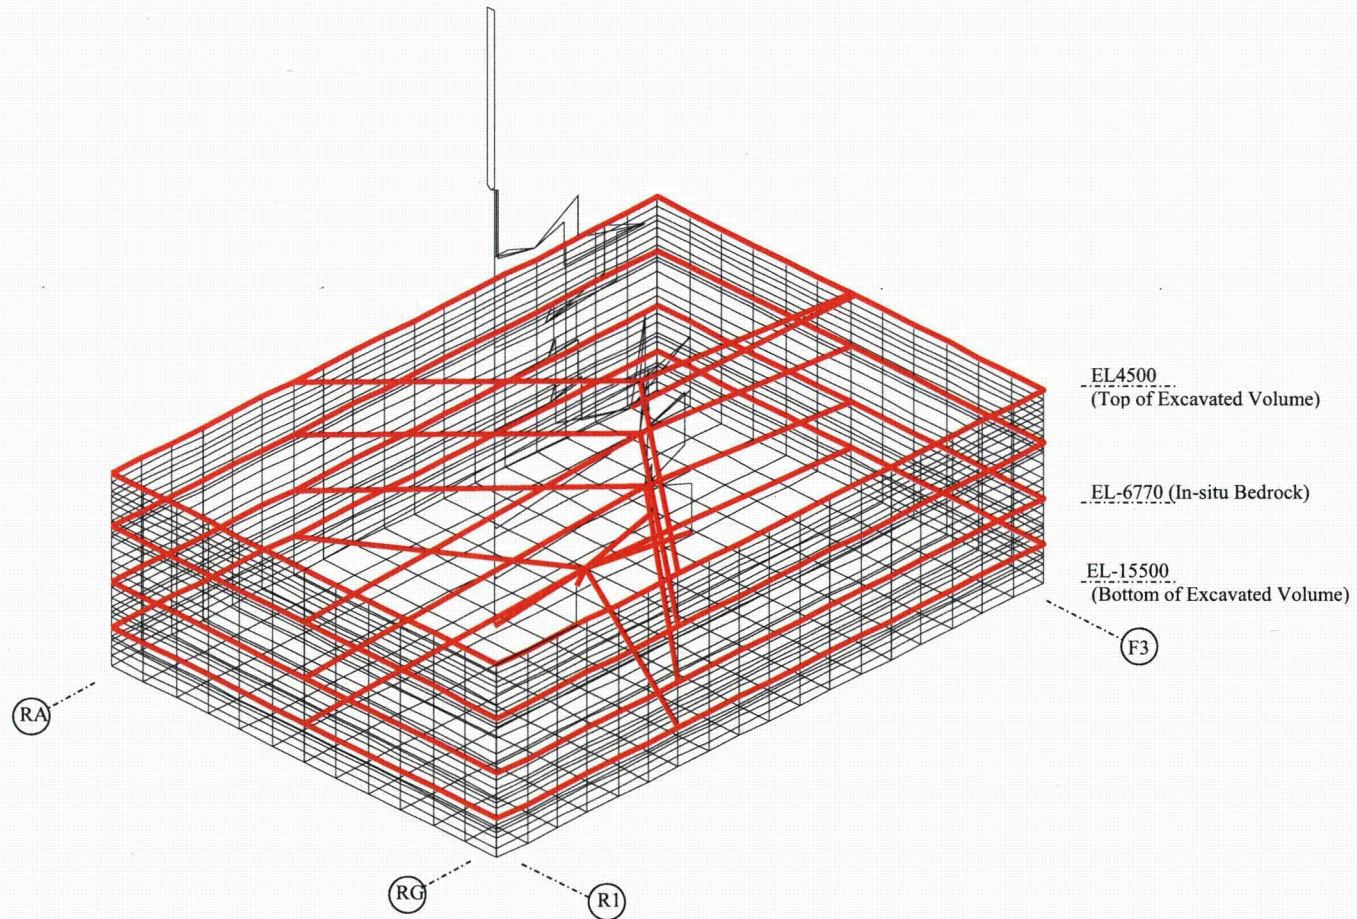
(2) SASSI2000 Plate Elements for RB/FB Exterior Walls
